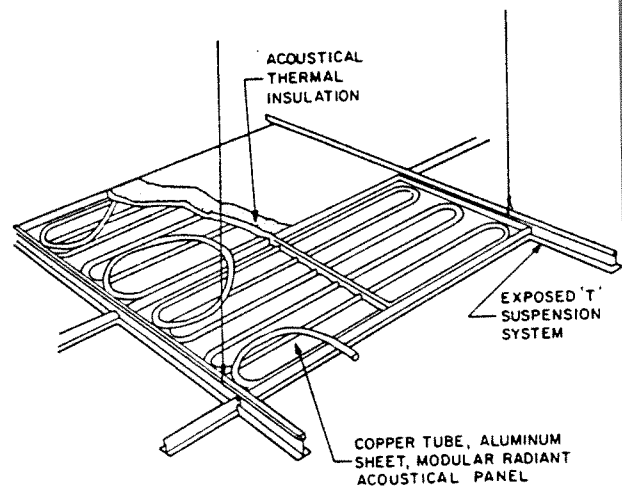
Metal Ceiling Panels Bonded to Copper Tubing
